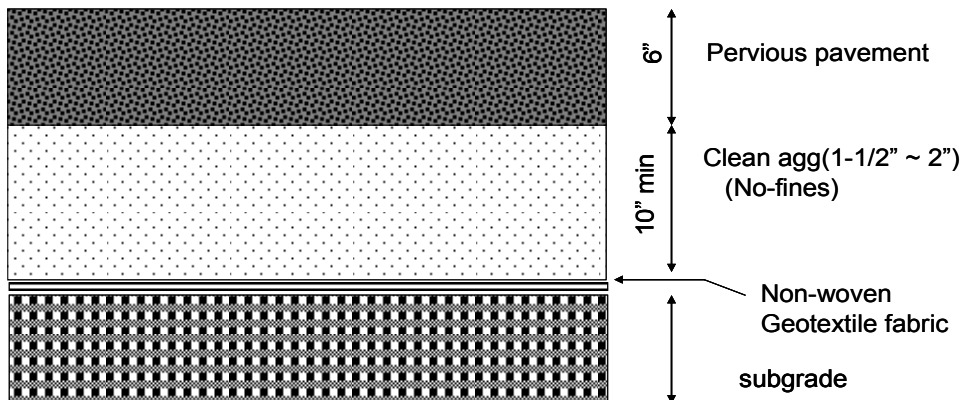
Pervious concrete pavement design for heavy traffic, after (www.stonecreekmaterials.com).
